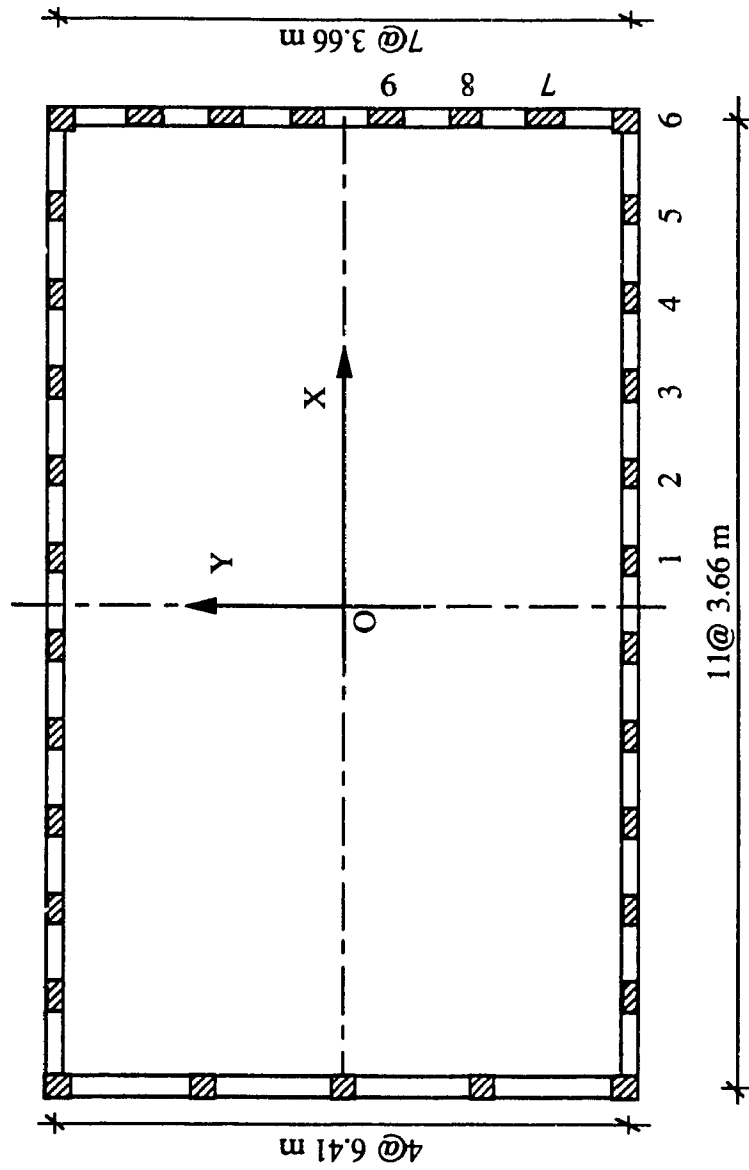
Plan layout of unsymmetric 30-story framed tube structure subject to lateral loading
